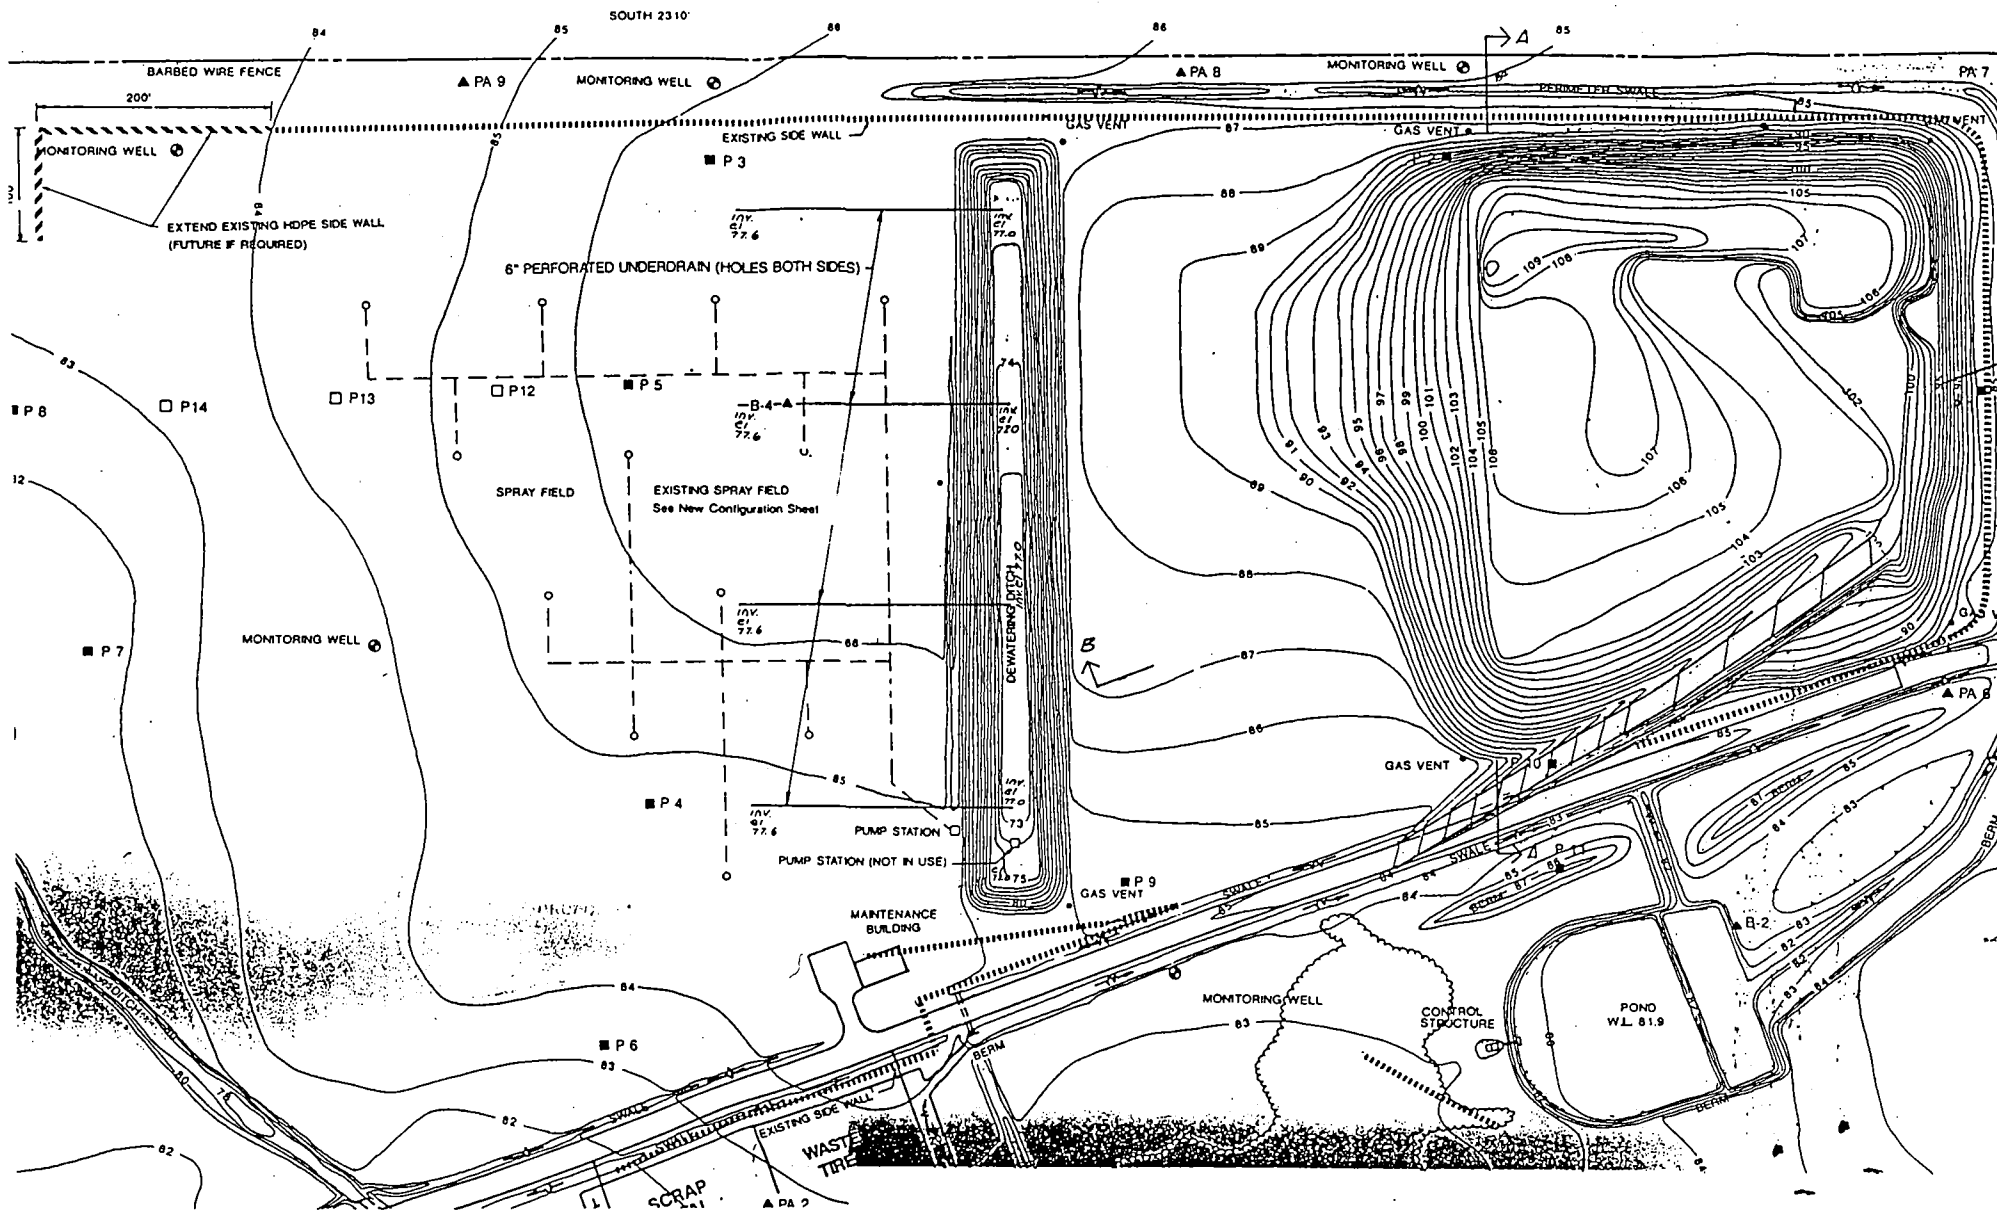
Improvement Site Plan (per 8/2/93 Wade-Trim Sheet 4/6)
